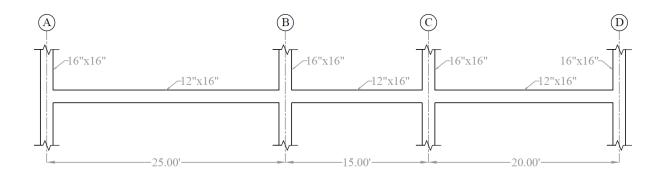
Reinforced Concrete Continuous Beam at intermediate floor level
